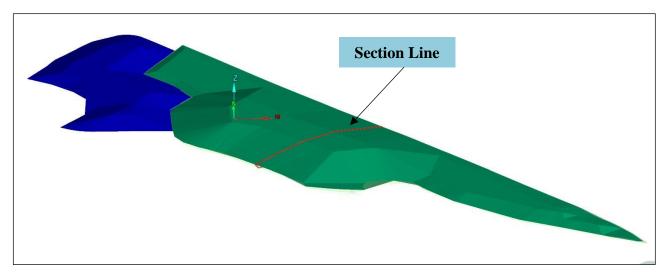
Vulcan Main Pit Final Landform Design – North Facing View Showing In-Pit Dump (Green) and Ex-Pit Dump (Blue) Footprints
